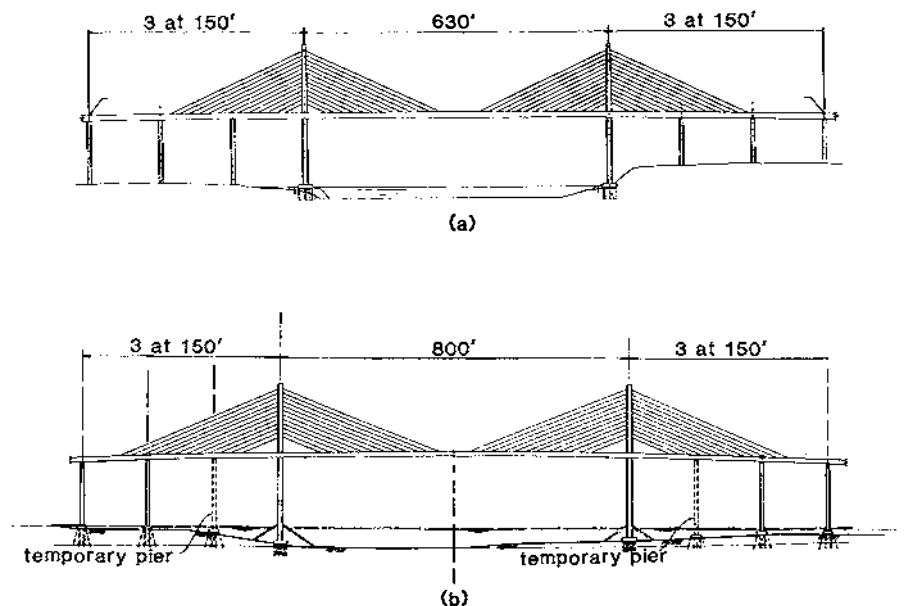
Cable-stay span arrangement: (a) James River Bridge, and (b) Cooper River Bridge.
